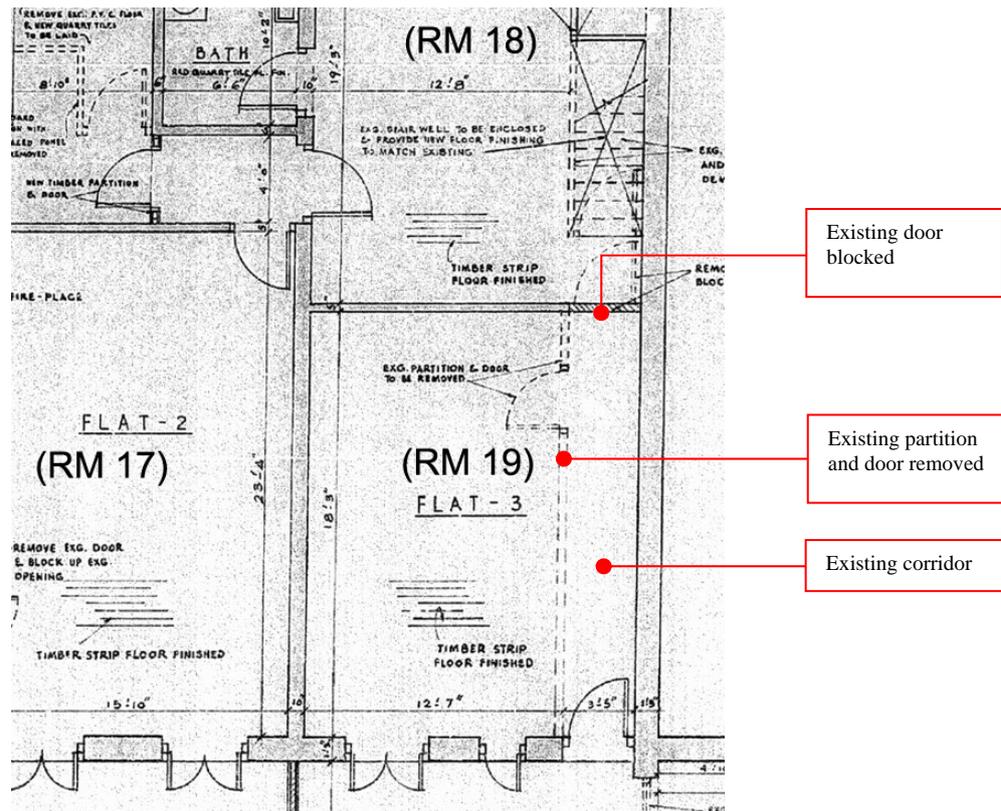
Extracted first floor plan of RM 19 at the main building for the proposed conversion to staff quarters at the Government Stores in 1969.
